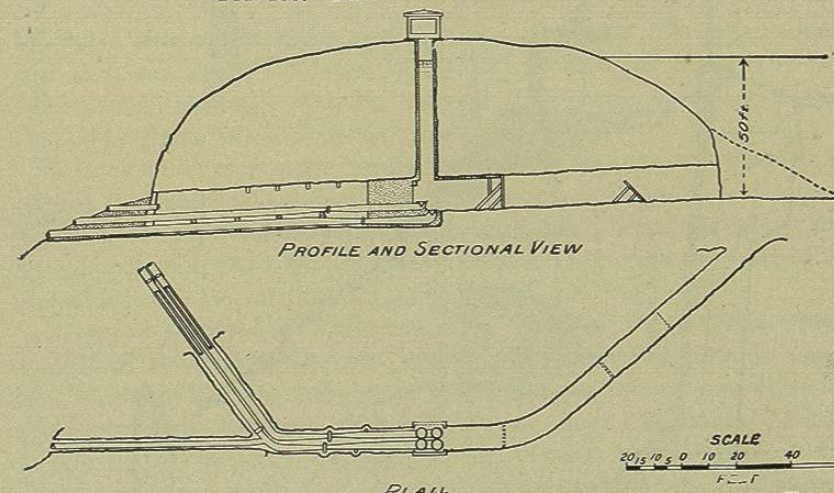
PROFILE AND SECTIONAL VIEW AND PLAN OF WASTEWAY TUNNEL, SWEETWATER DAM
